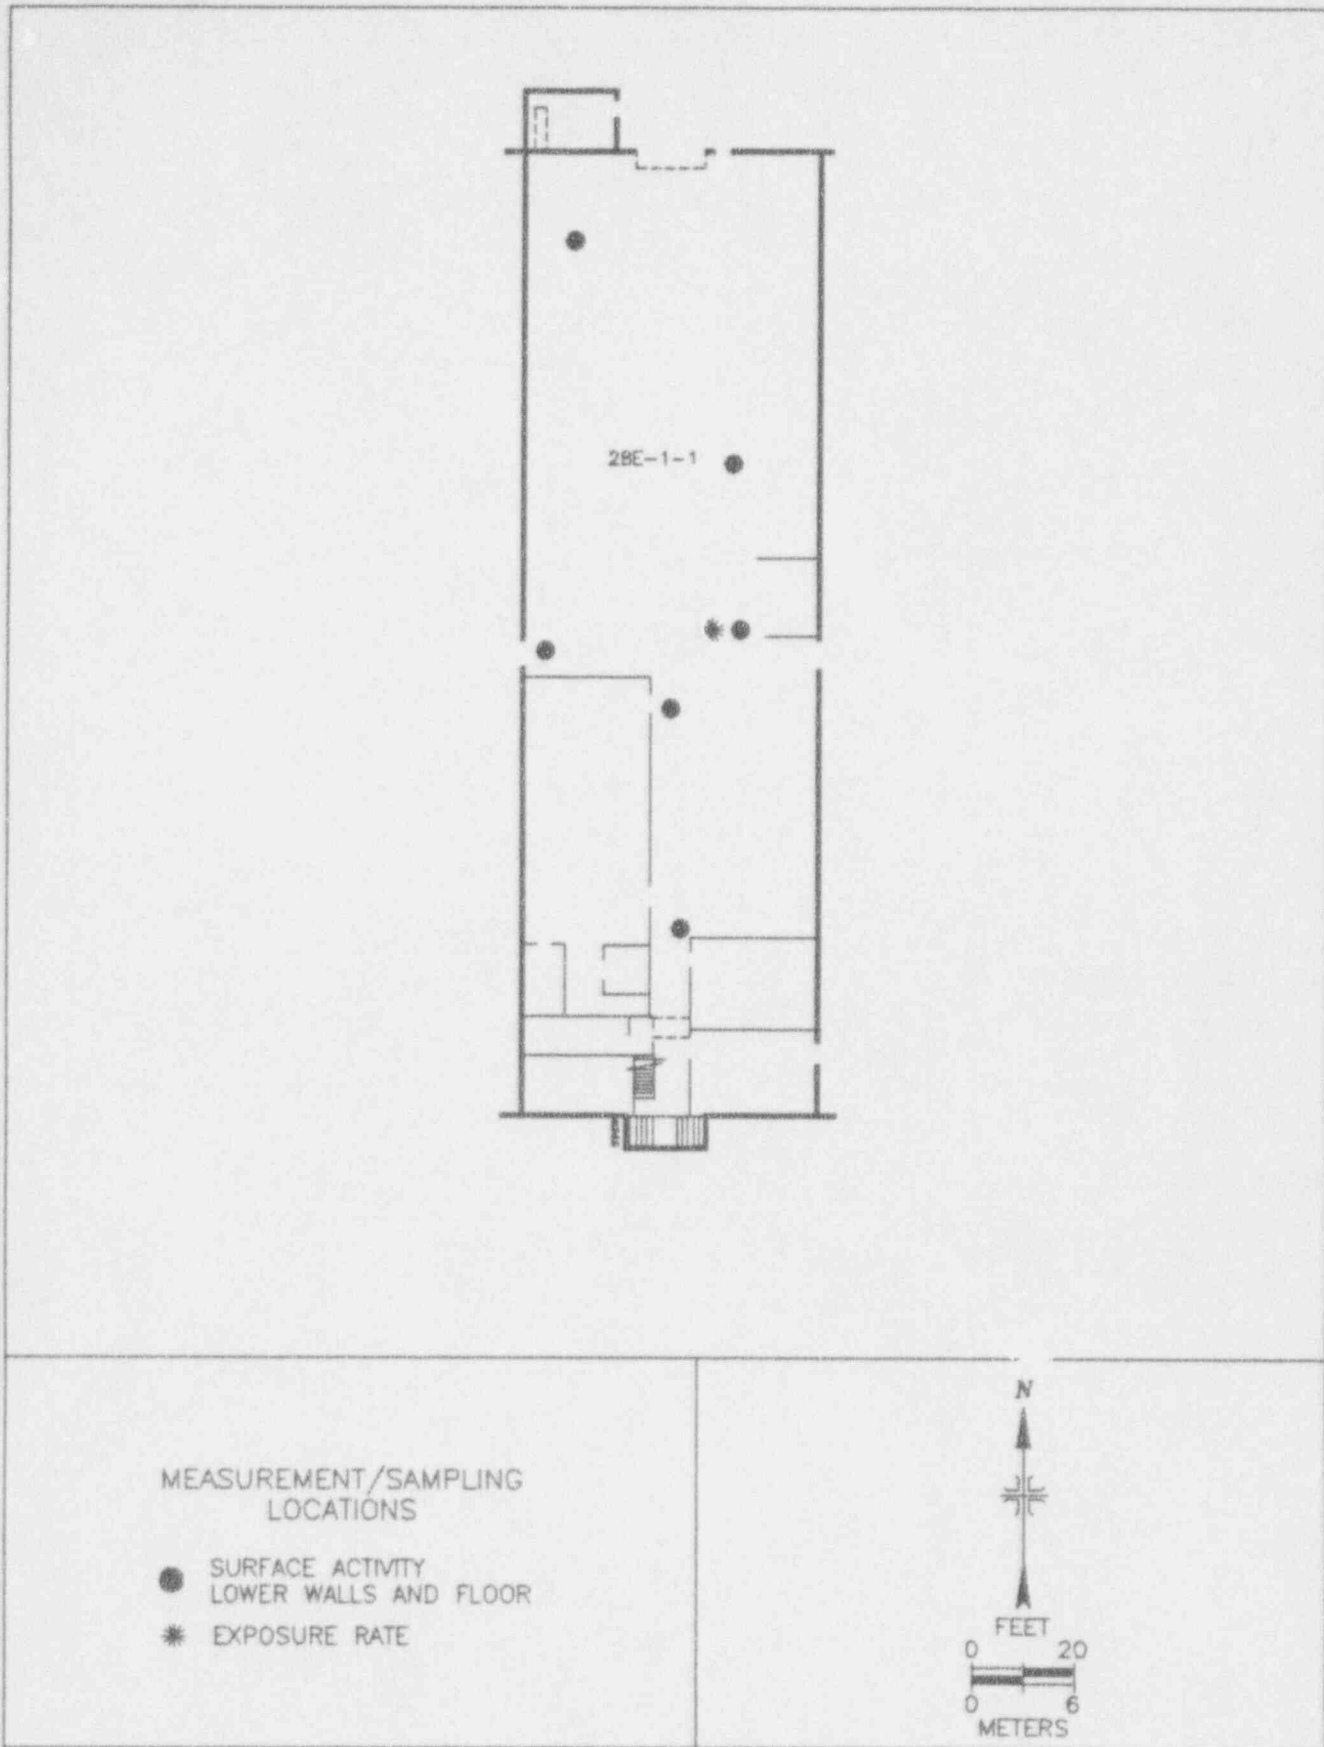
Building 8, First Floor - Measurement and Sampling Locations
